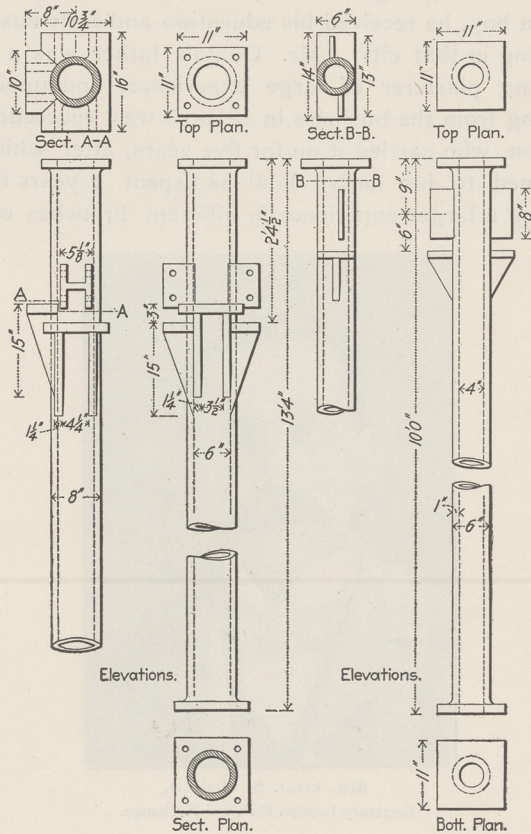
DETAILS OF THE 6 IN. AND 8 IN. COLUMNS.
